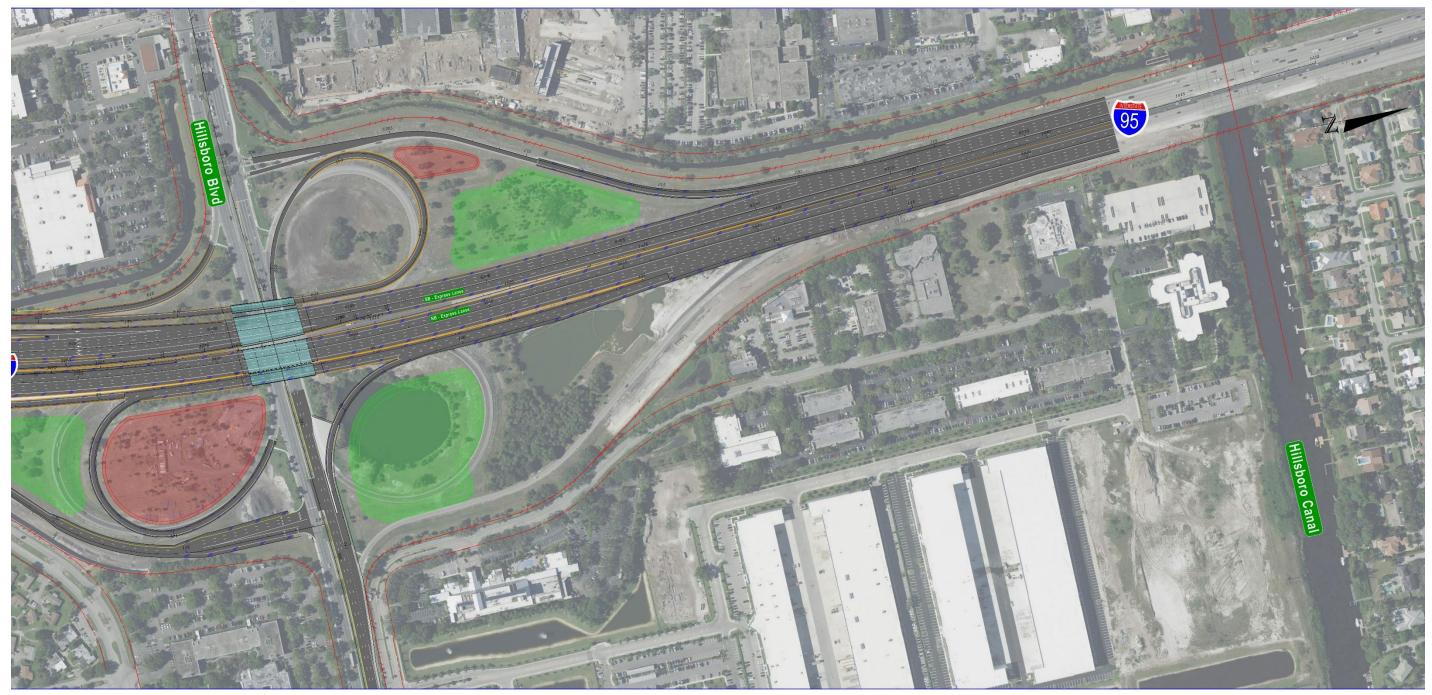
Alternative 2 Concept Plan (North of SW 10th Street) (2 of 2)
